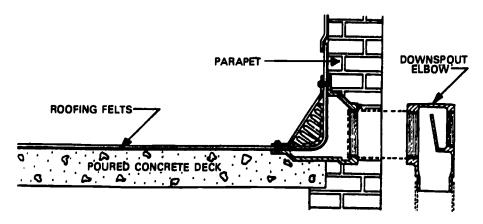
A series parapet drain installed through a wall and used in conjunction with a downspout elbow
